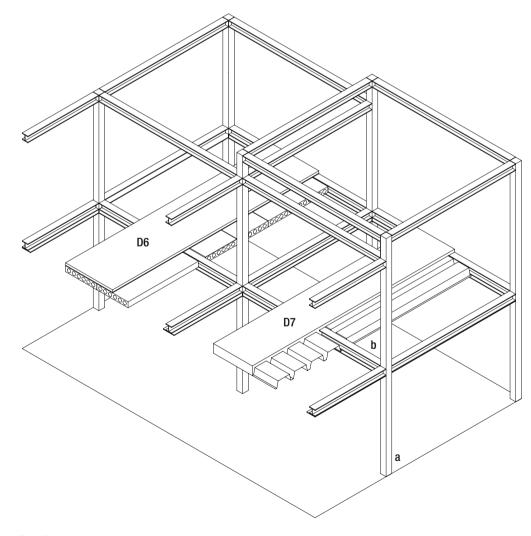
Frame with continuous columns shown here with floor constructions equal to the beam depth (e.g. Slimfloor)
